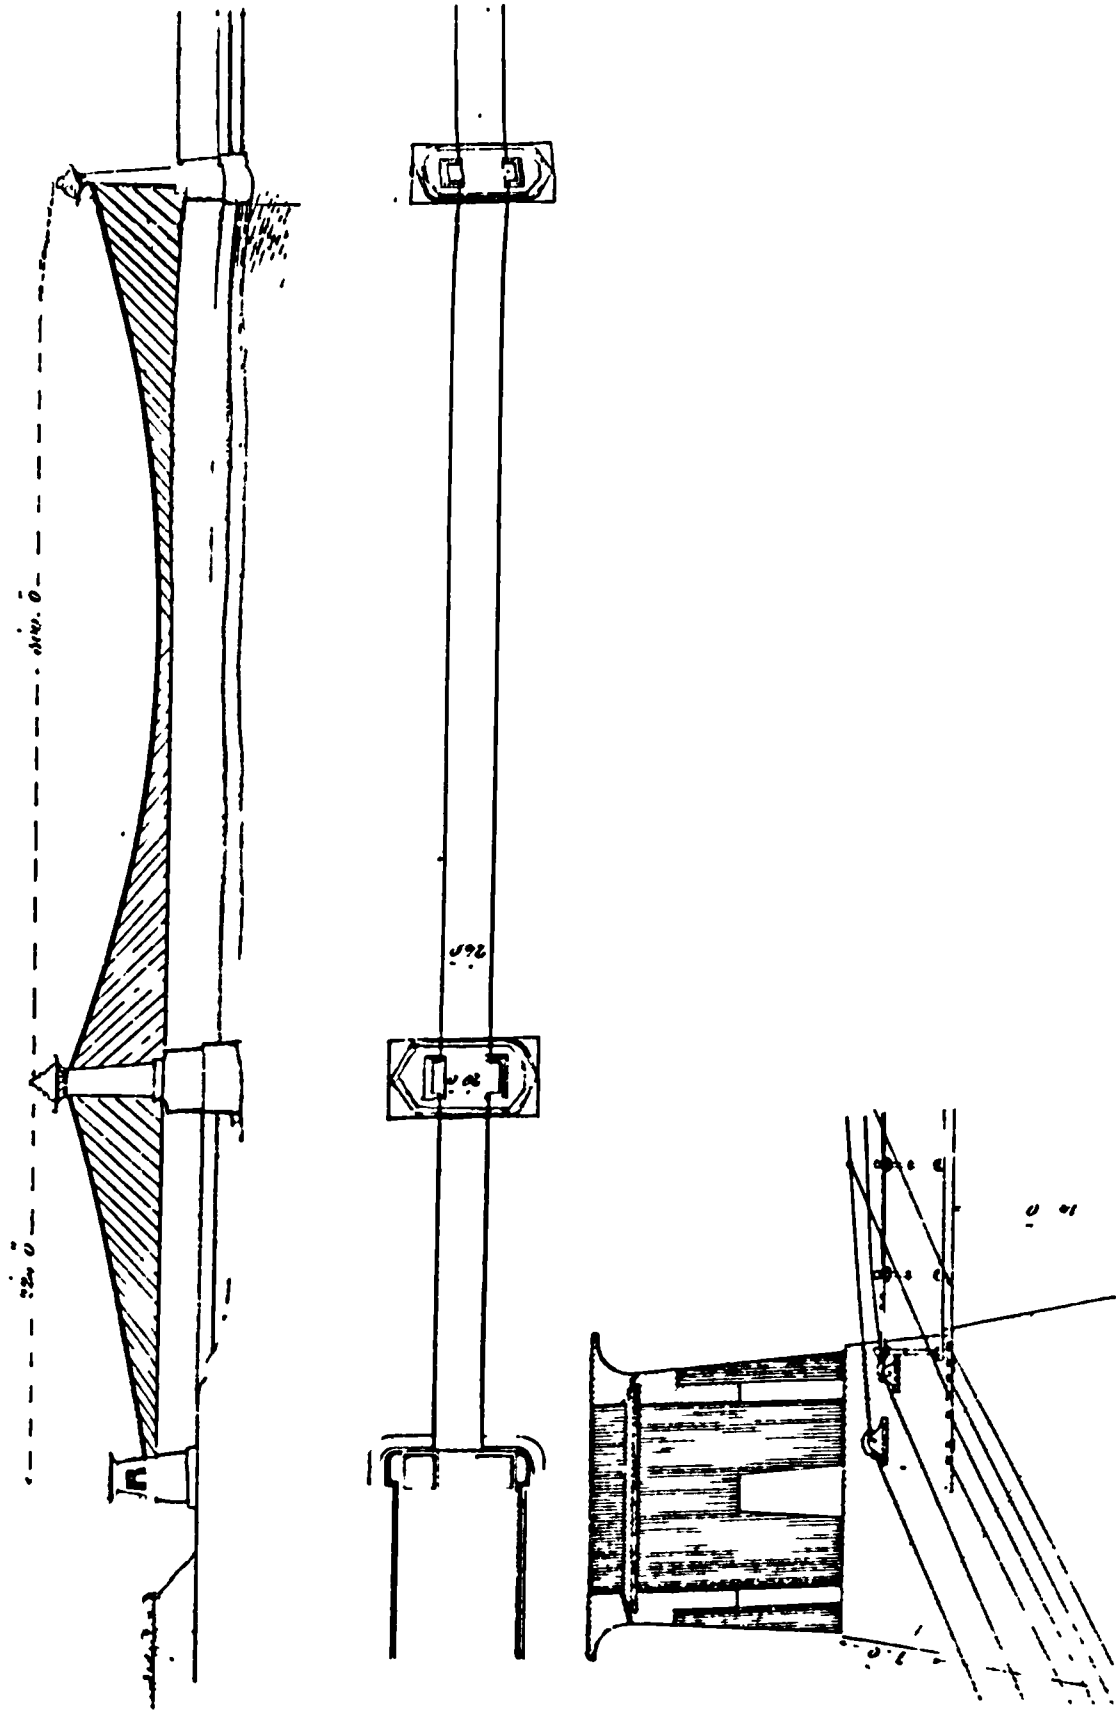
Goodwyn's Proposed Bridge at Agra : Elevation, Plan and Section of Toll House
